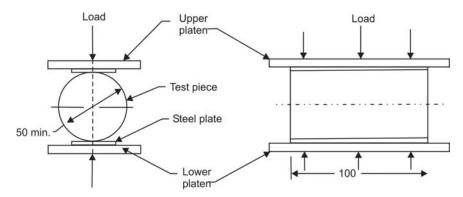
General Arrangement for Testing Tensile Strength of Building Stone
